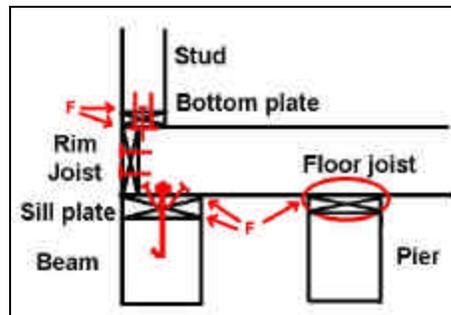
Typical pier and beam foundation showing connections and failure points (in red). However, piers are rarely attached to the flooring (circled).
